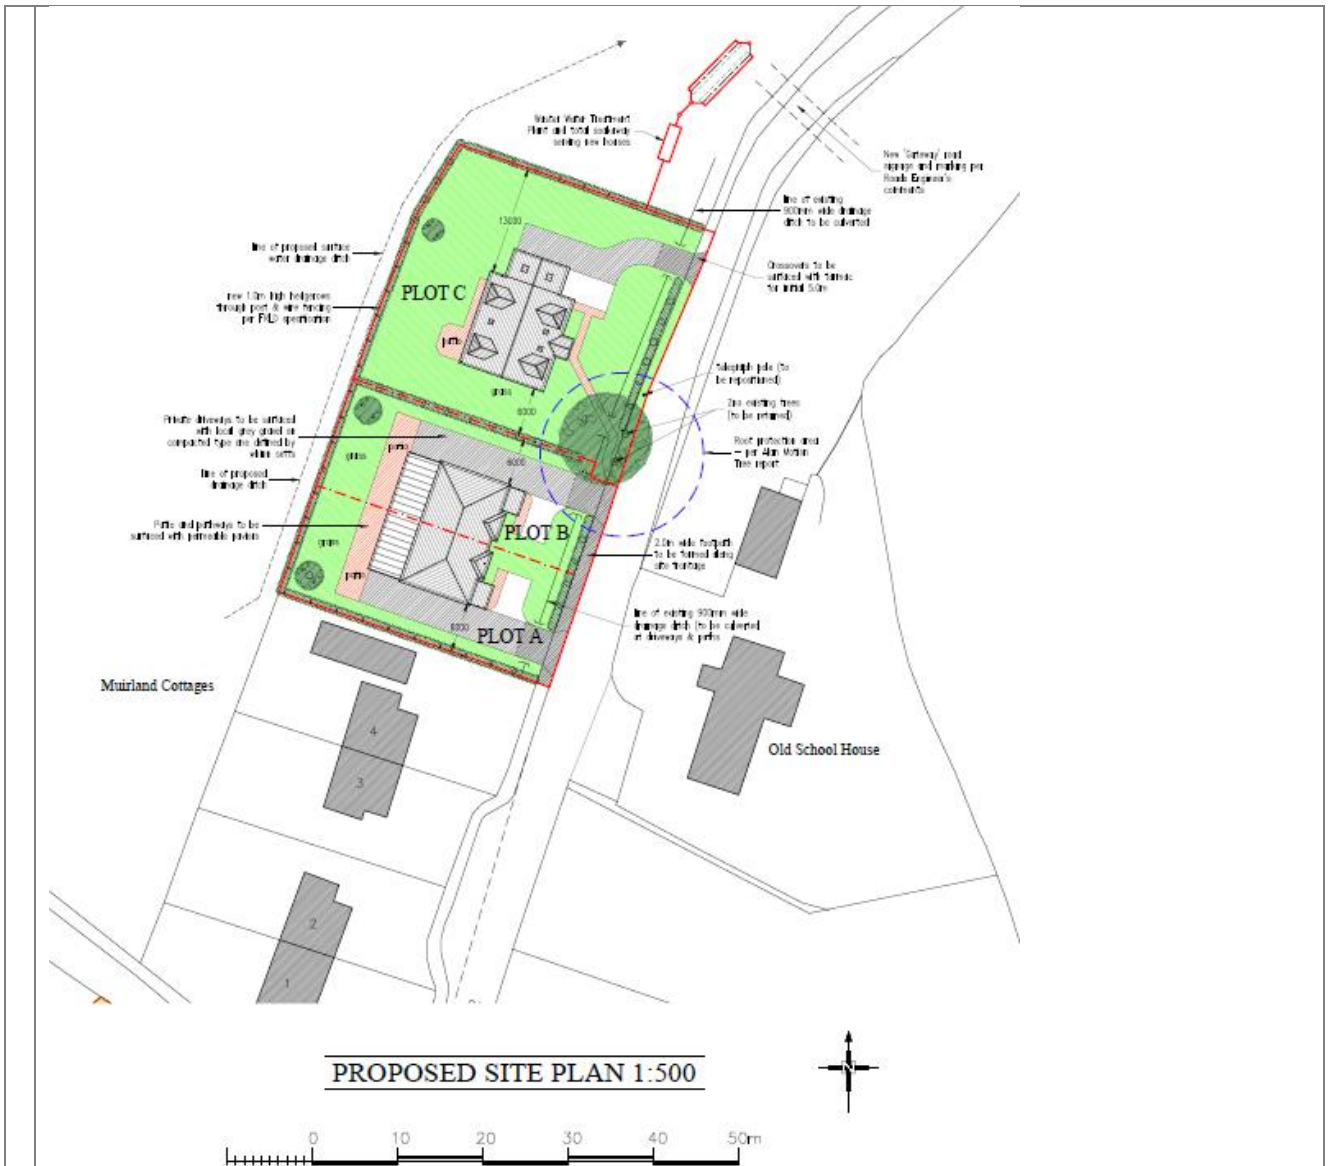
Extract from Proposed Site Plan 01 Rev J (not to scale)
